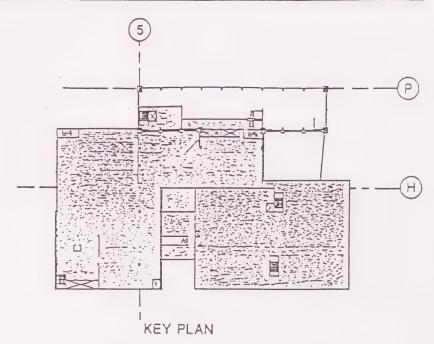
Basement Plan Showing Areas Impacted by Construction
